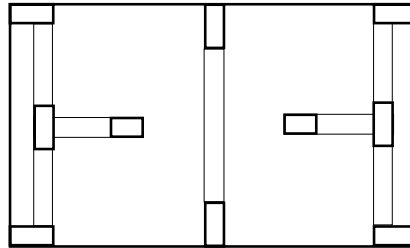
Building plans with open to sky ducts and staircases placed between floor areas
